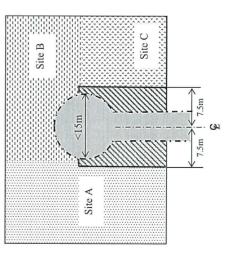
Example (4) of Building Setback - Site at the end of the street/ cul-de-sac
